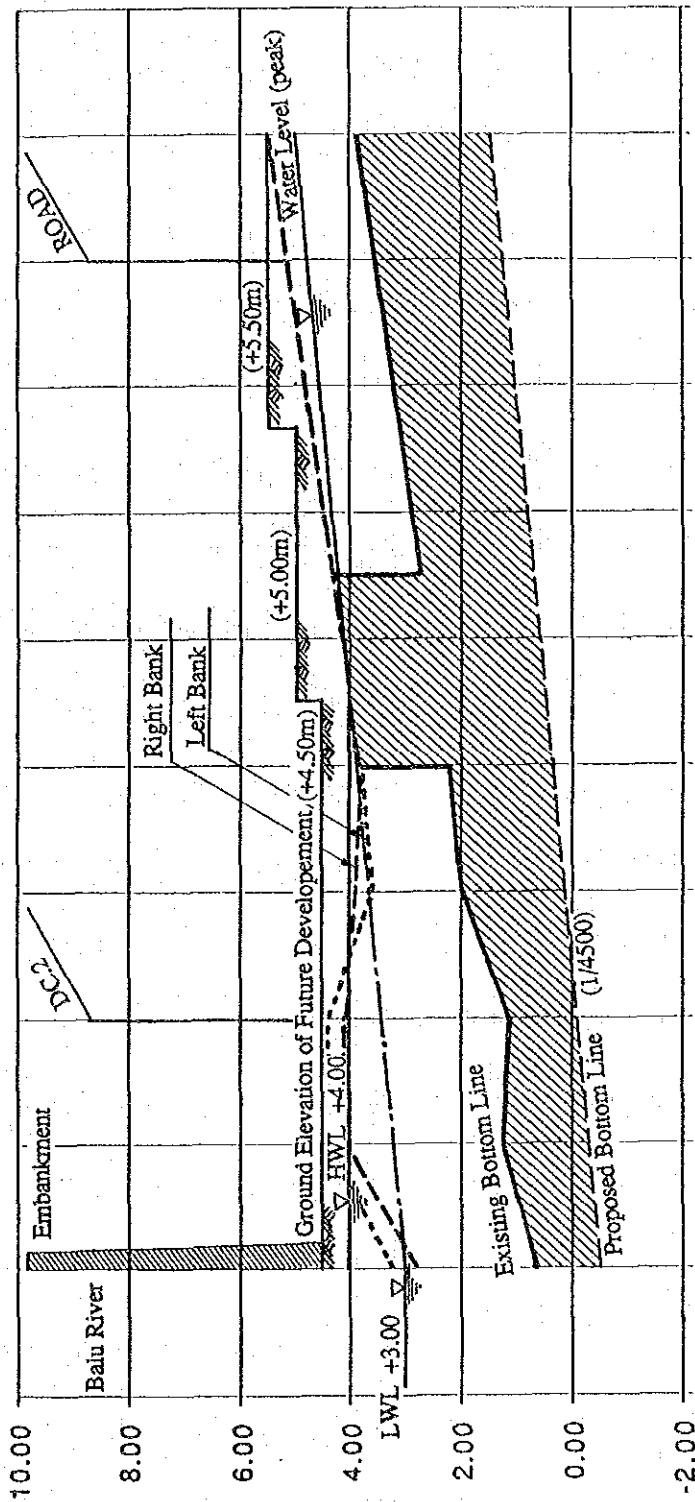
(1) PROPOSED LONGITUDINAL AND CROSS SECTIONS
